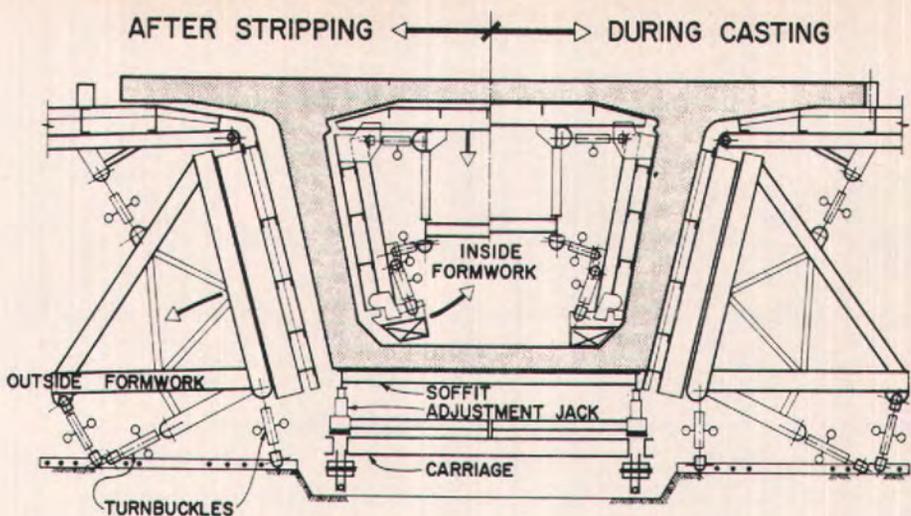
(a). Formwork for short-line method. It should be designed to facilitate inspection.
